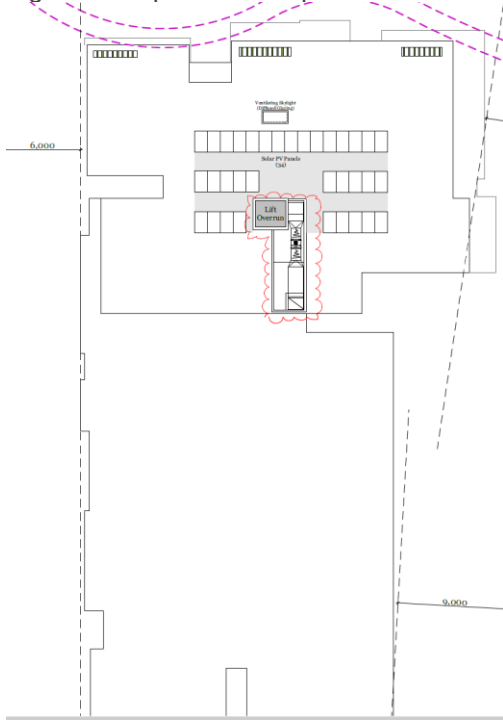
and 8 below illustrate the approved roof design and proposed location of the exhaust system.
